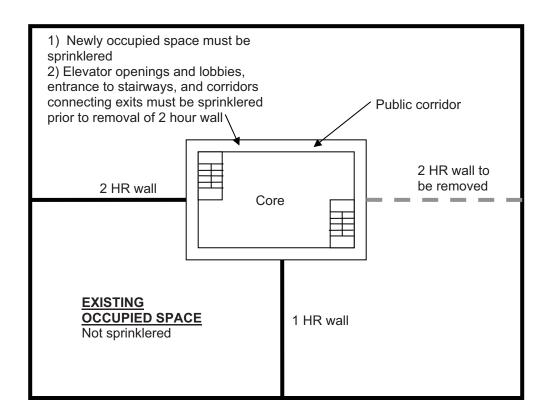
REMOVAL OF A 2-HOUR WALL ON AN EXISTING, COMPARTMENTED FLOOR
